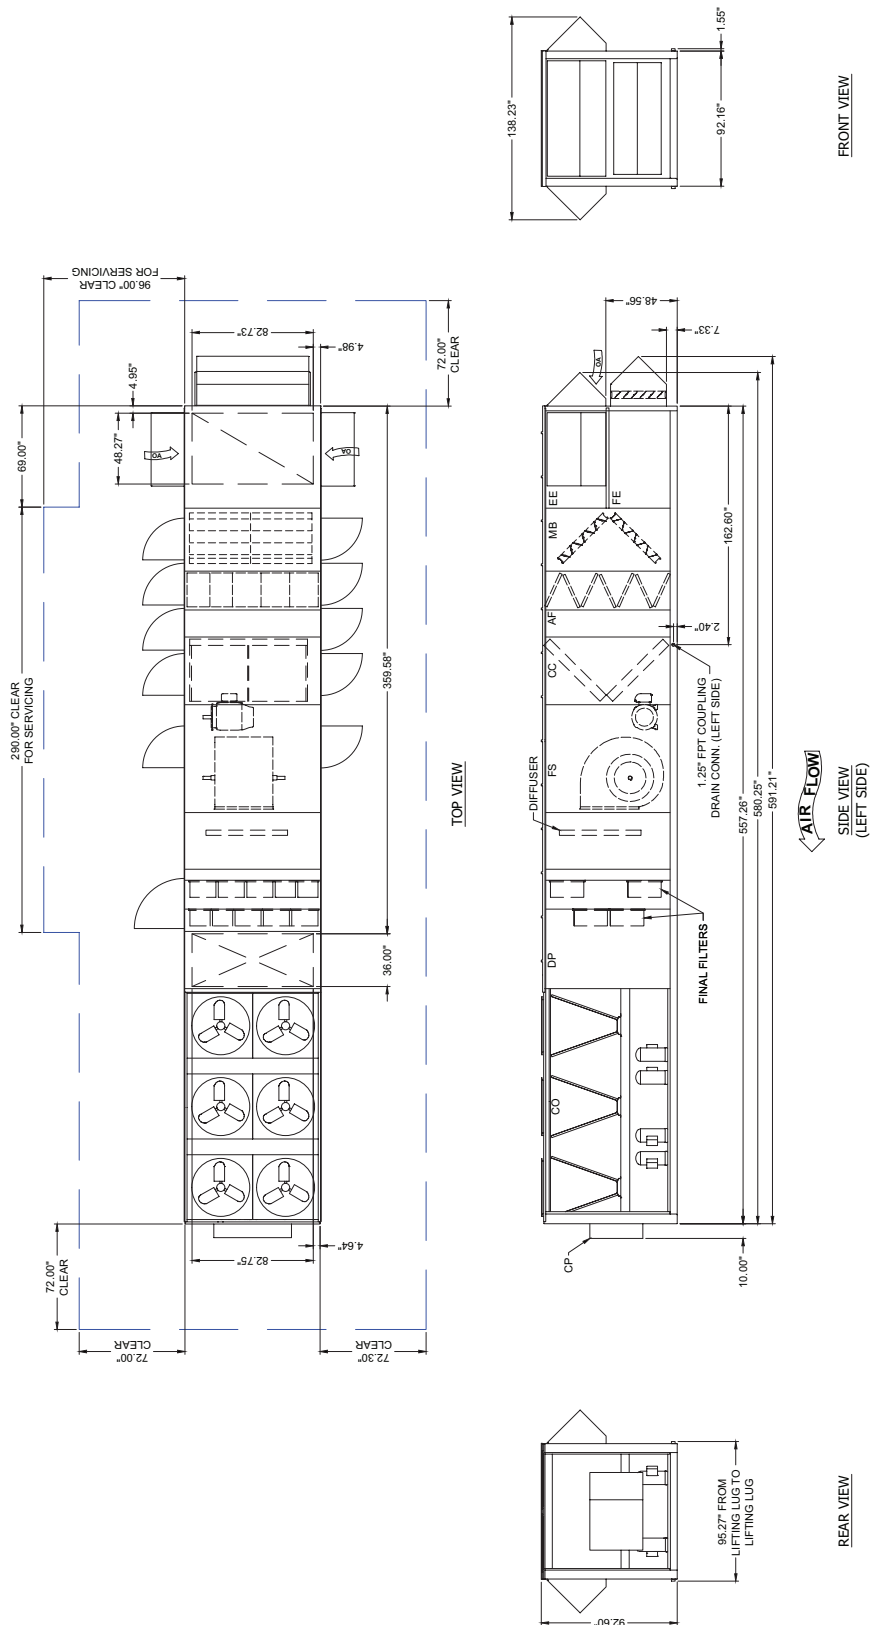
GENERAL ARRANGEMENT DRAWING
